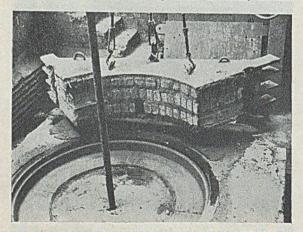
Re-assembly; View of the Bottom Section below the Main-door Position.
